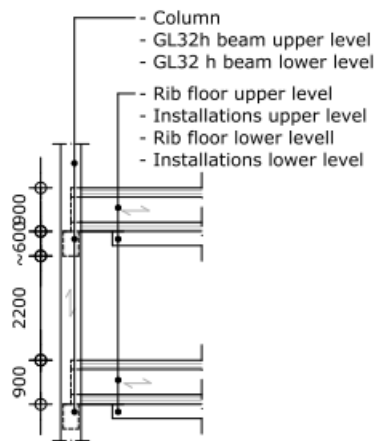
Rib floor on beam connection at driveway crossing in mm
